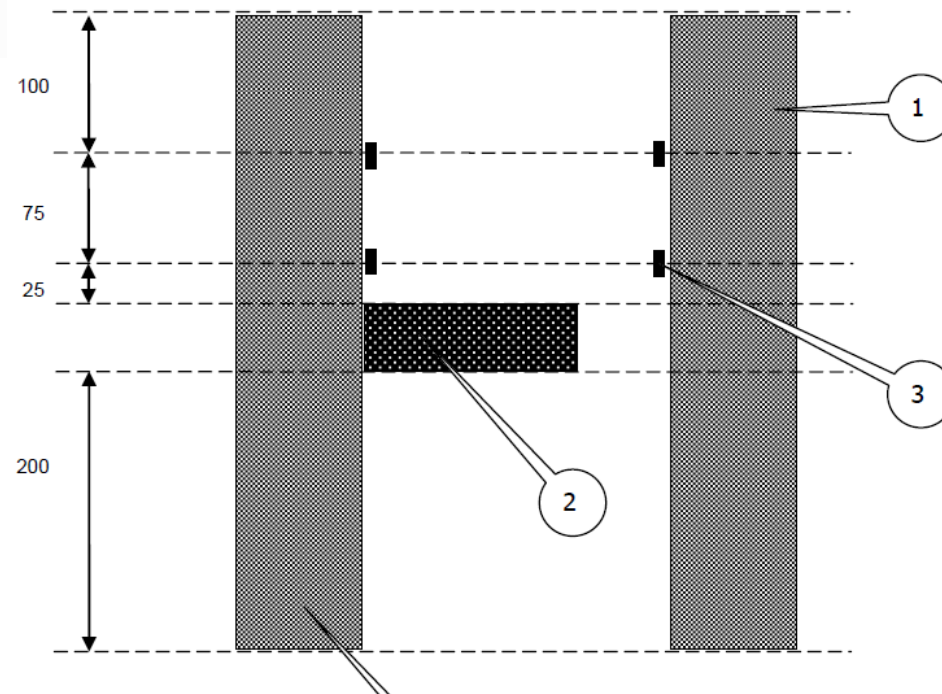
test configuration for cavity barriers within walls (elevation)
